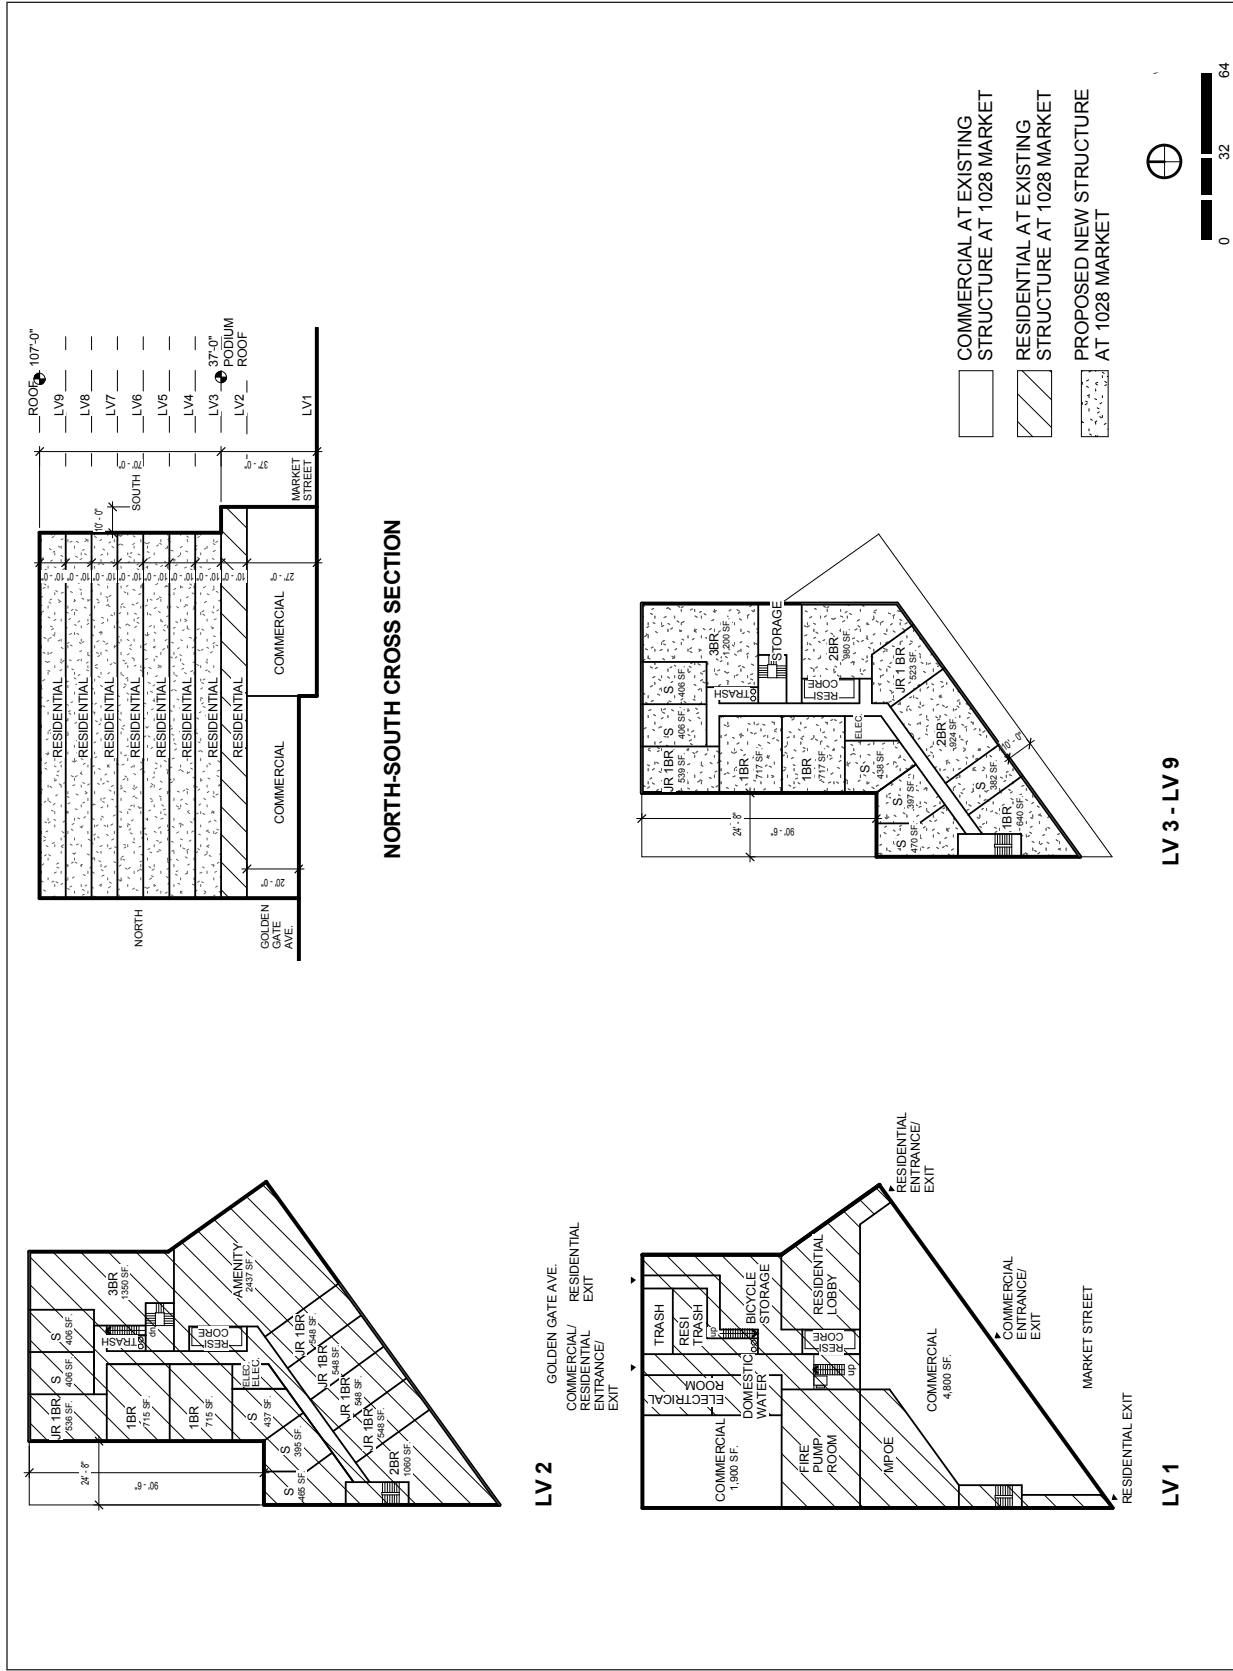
PARTIAL PRESERVATION ALTERNATIVE – REPRESENTATIVE FLOOR PLANS AND CROSS SECTION
